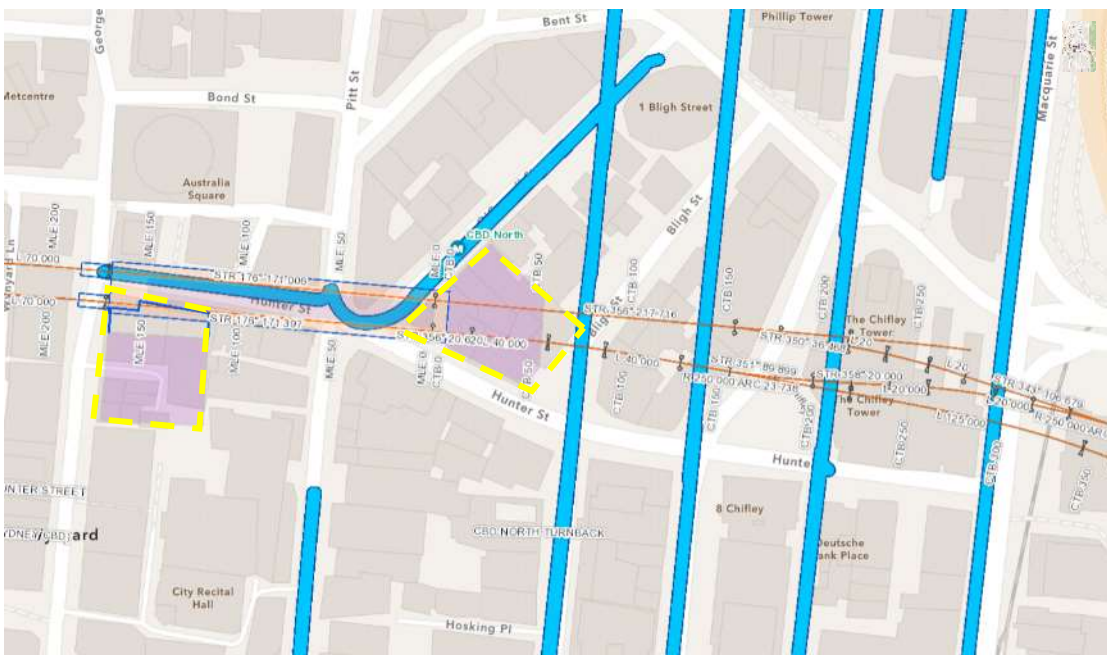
Bannelong Stormwater Channel – plan of underground layout with indicative site boundaries shown dashed.
